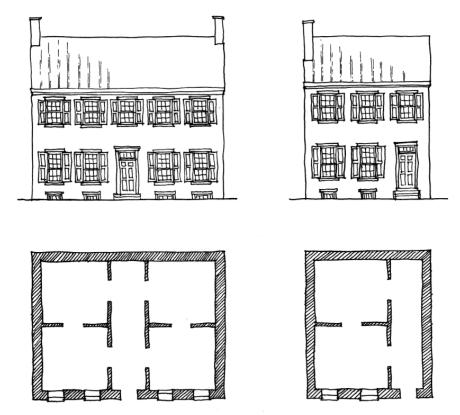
The center-hall plan house, with its symmetrical façade, is highly ordered. The side-hall plan house, although lacking a symmetrical façade, is also a formal, ordered plan-type in which the doors and windows of the front façade are uniformly spaced and directly related to the floor plan inside the building
